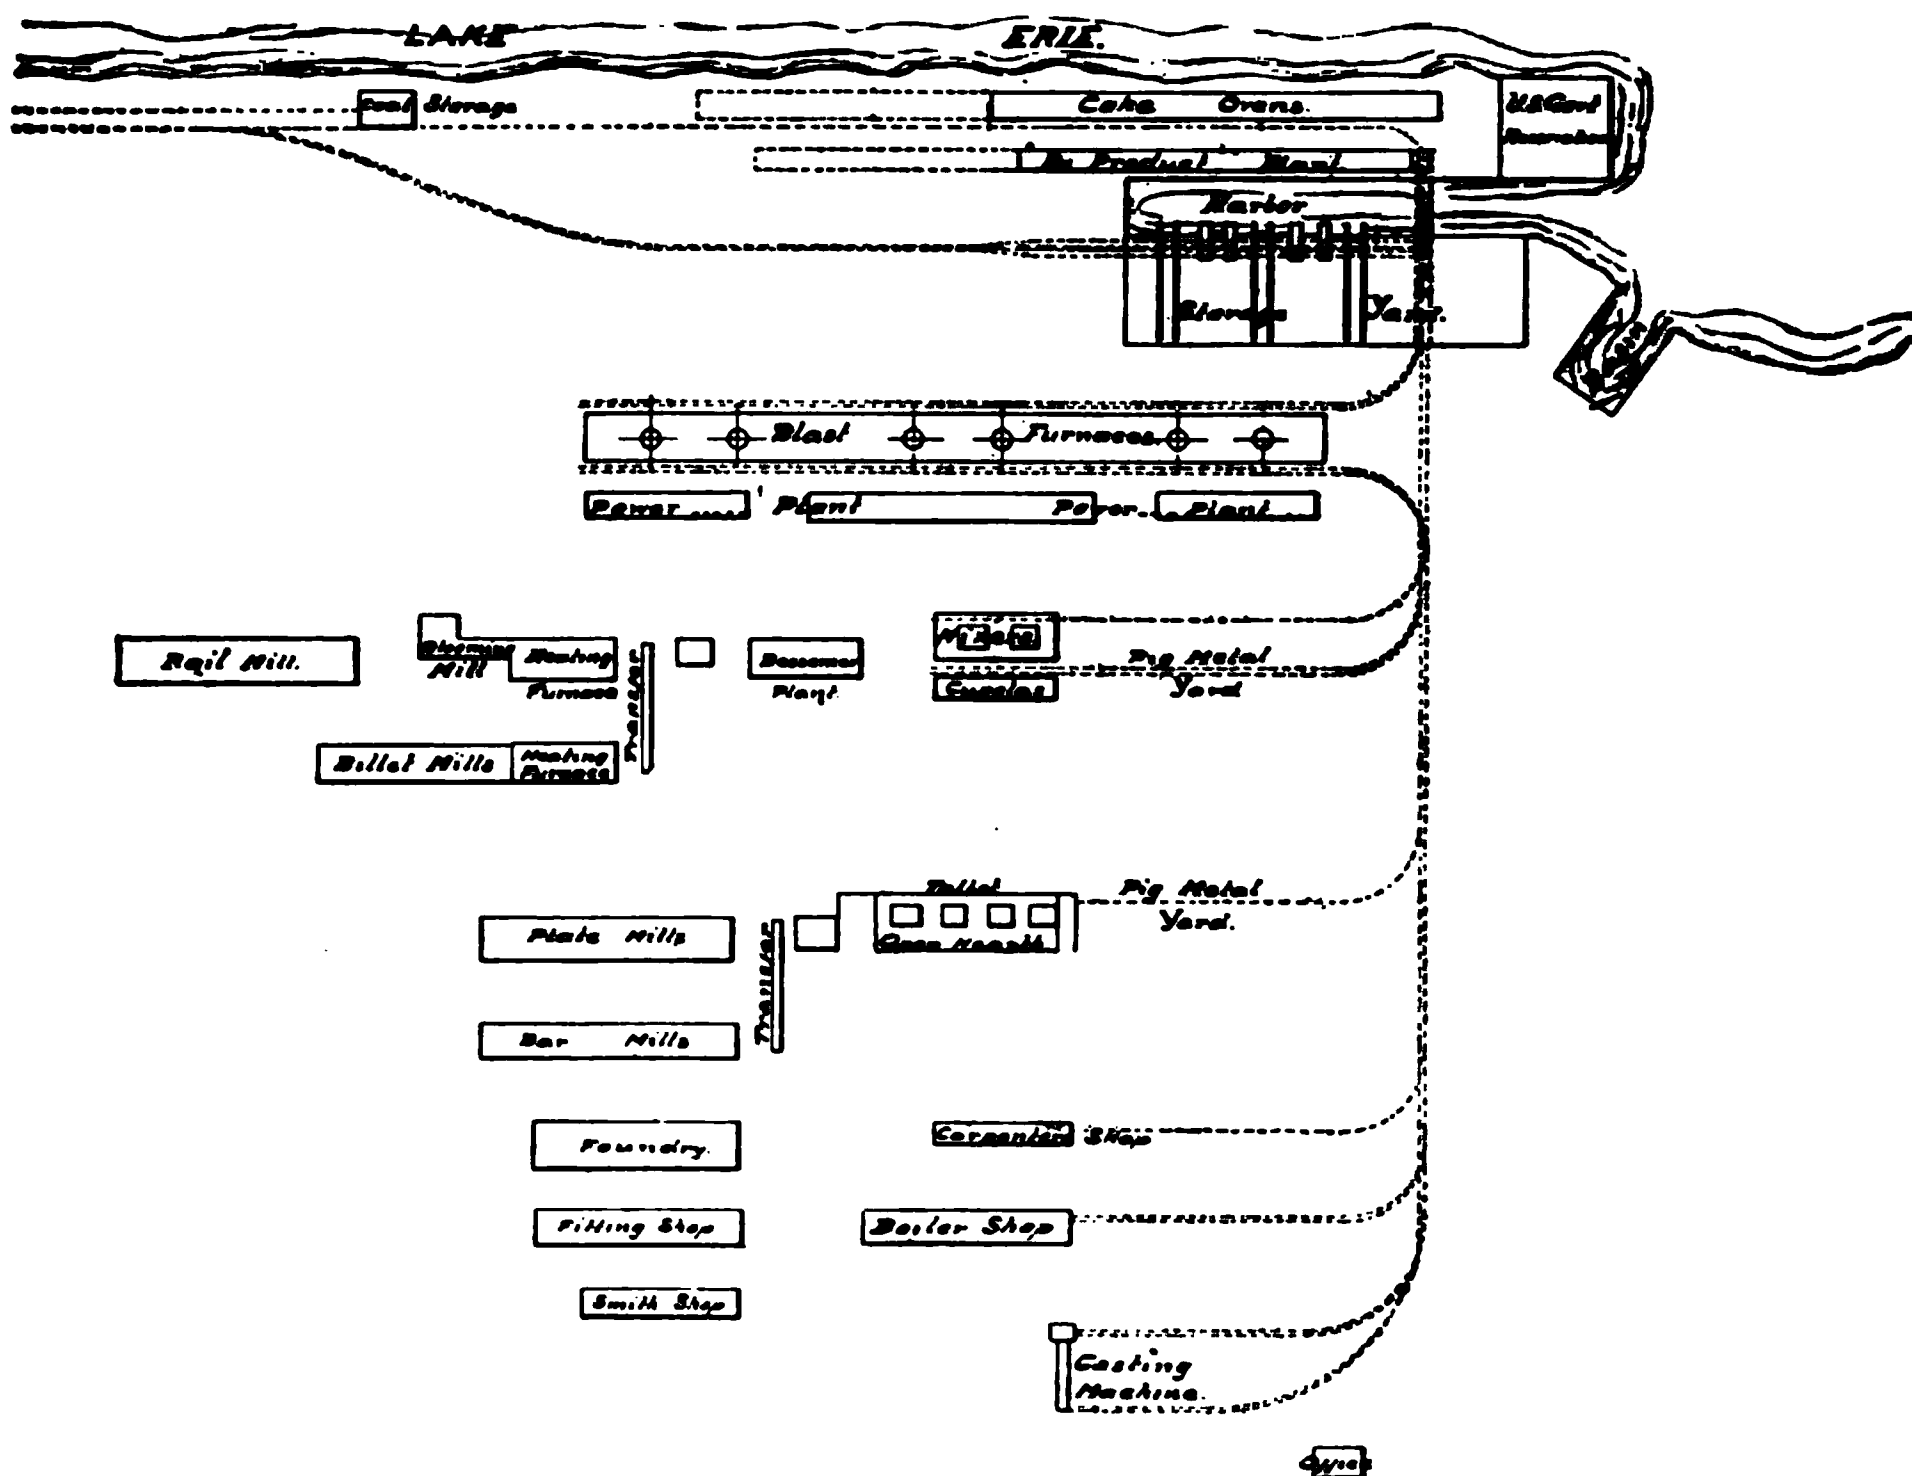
SKETCH FROM MEMORY OF THE PLANS OF THE LACKAWANNA STEEL COMPANY'S NEW PLANT, UNDER CONSTRUCTION AT STONY POINT, NEAR BUFFALO, N.Y.
